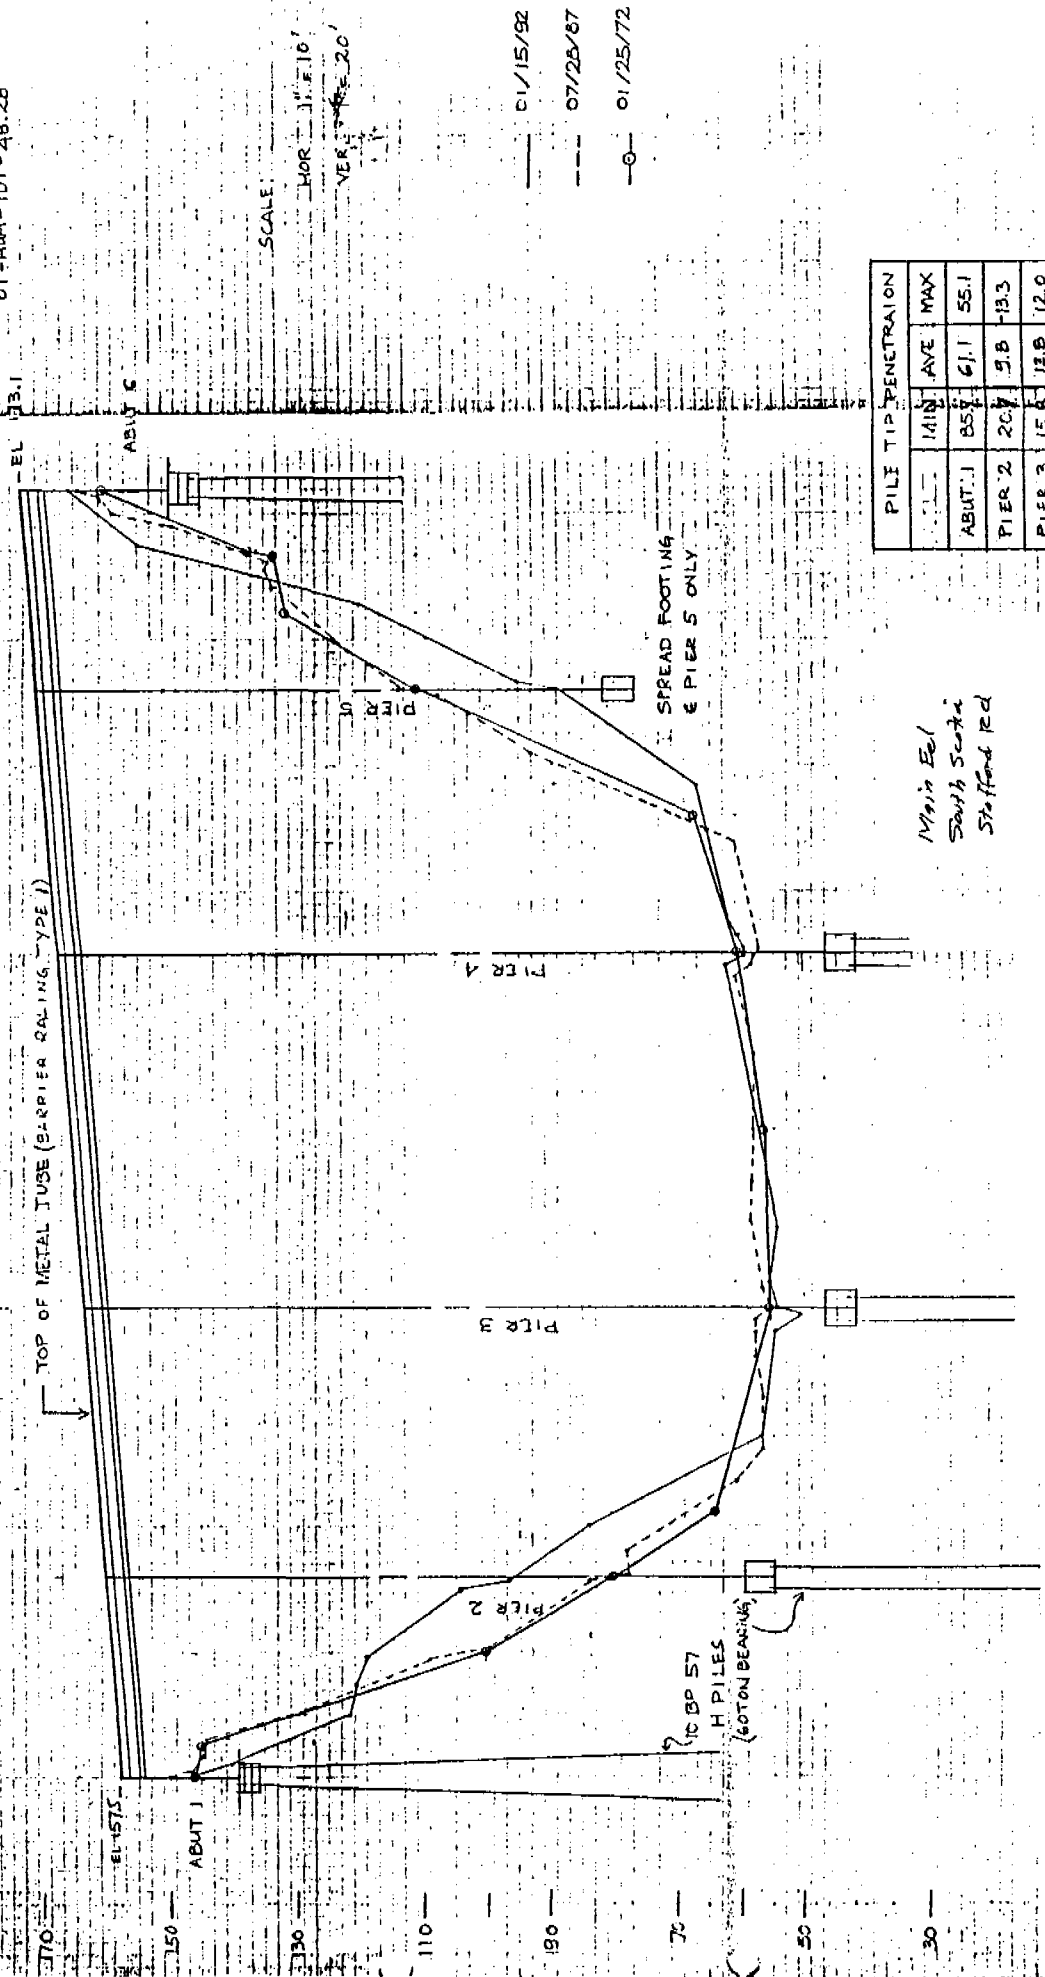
Cross-sections of Eel River at Rio Dell under the bridge at the north end of town.
